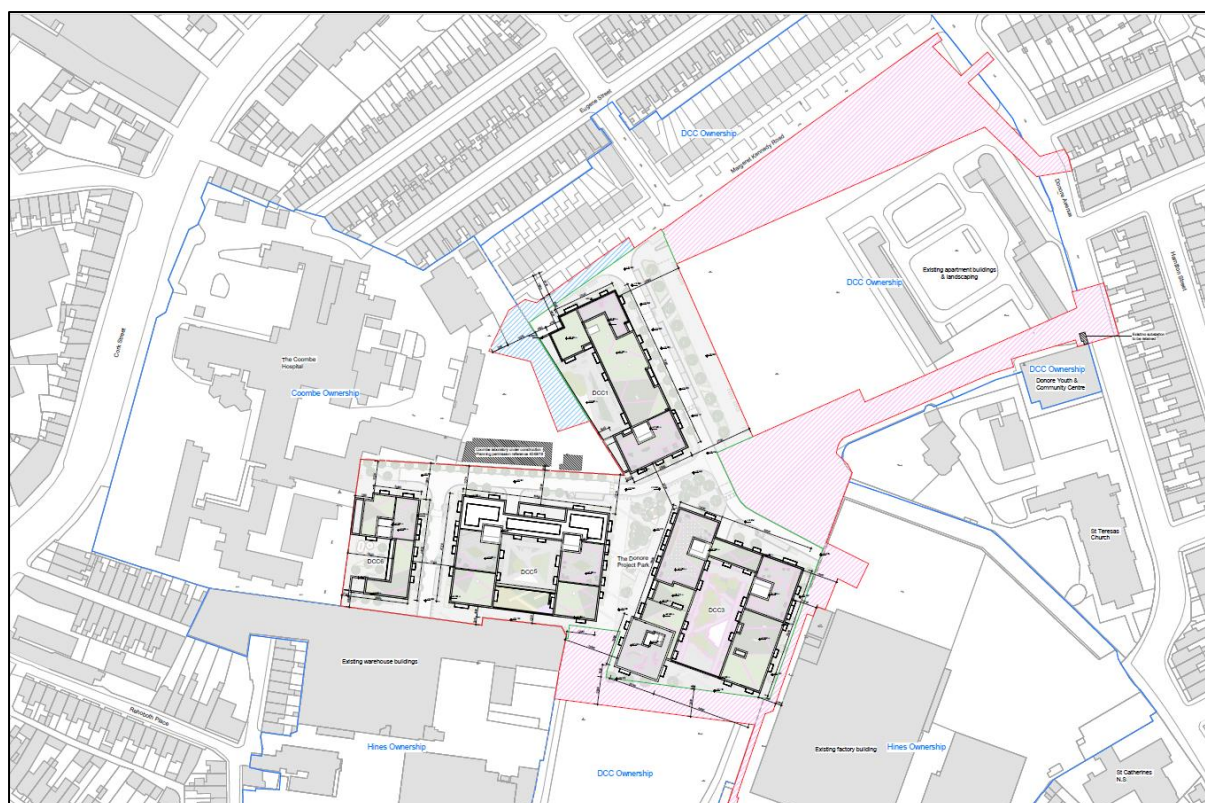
Proposed Site Layout (Source: DWG No.: STG-MW-S1b-00-RF-DR-A-1100002-S1-15, Metropolitan Workshop Ltd, September 2022)
